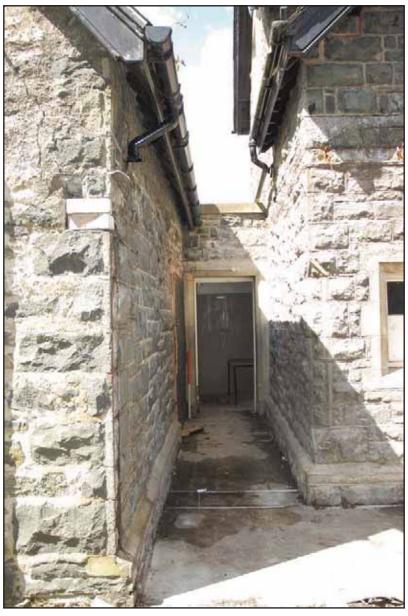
School Bank Road north building east facing elevation. - ground floor entrance for both north and south building. Scale: 1.0m.
